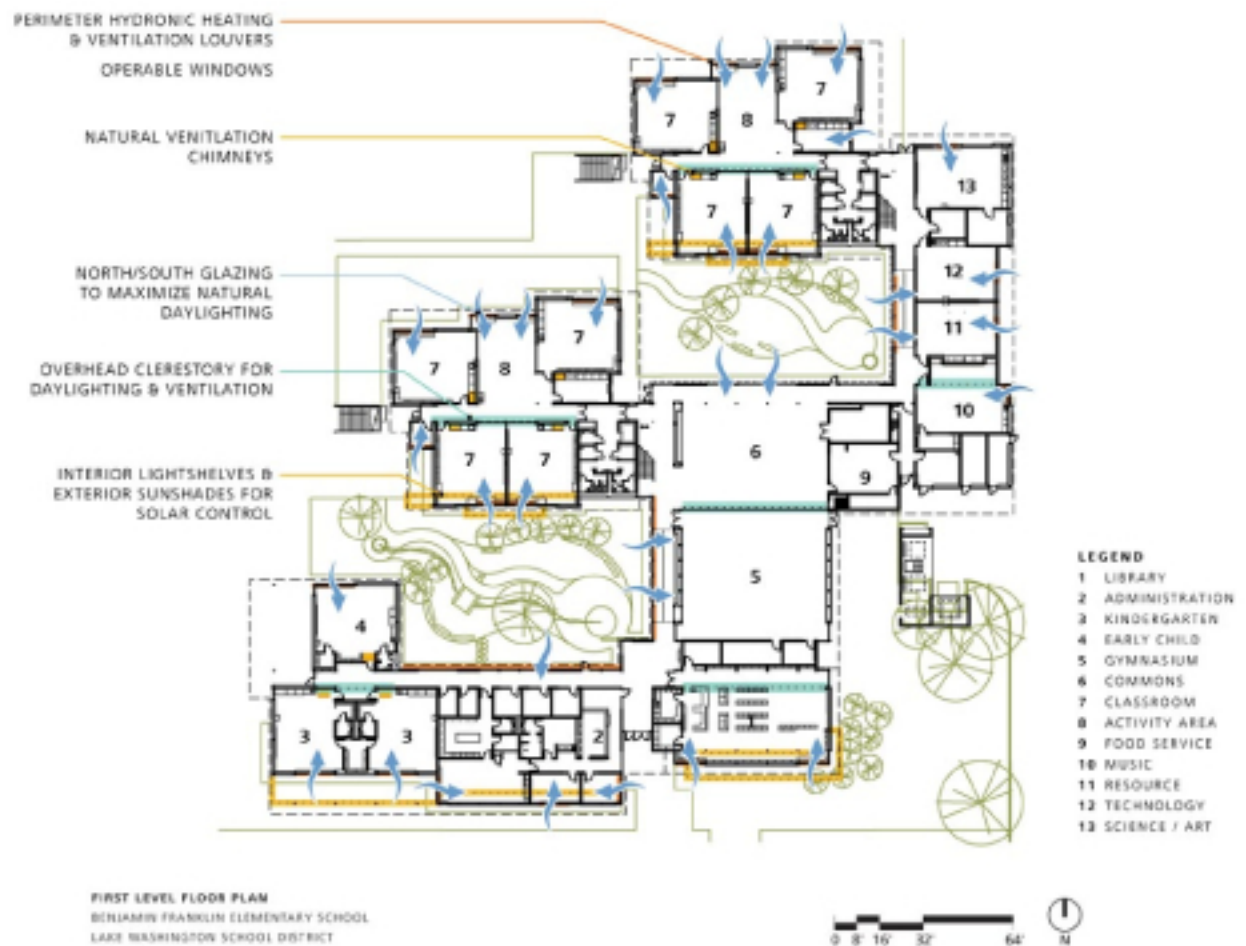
First Floor Plan of Ben Franklin Elementary School (Archinovations.com, 2010)
